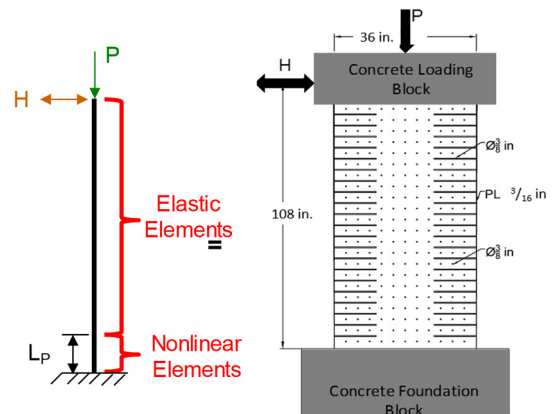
Representation of OpenSees models for the wall specimens (Note: 1 in. = 25.4 mm).
